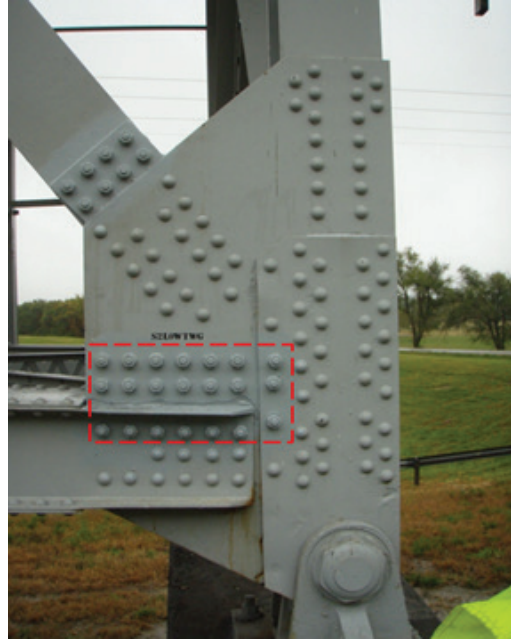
Plate installation (red outline) on the inside of the gusset plate to address section loss on the horizontal shear plane
